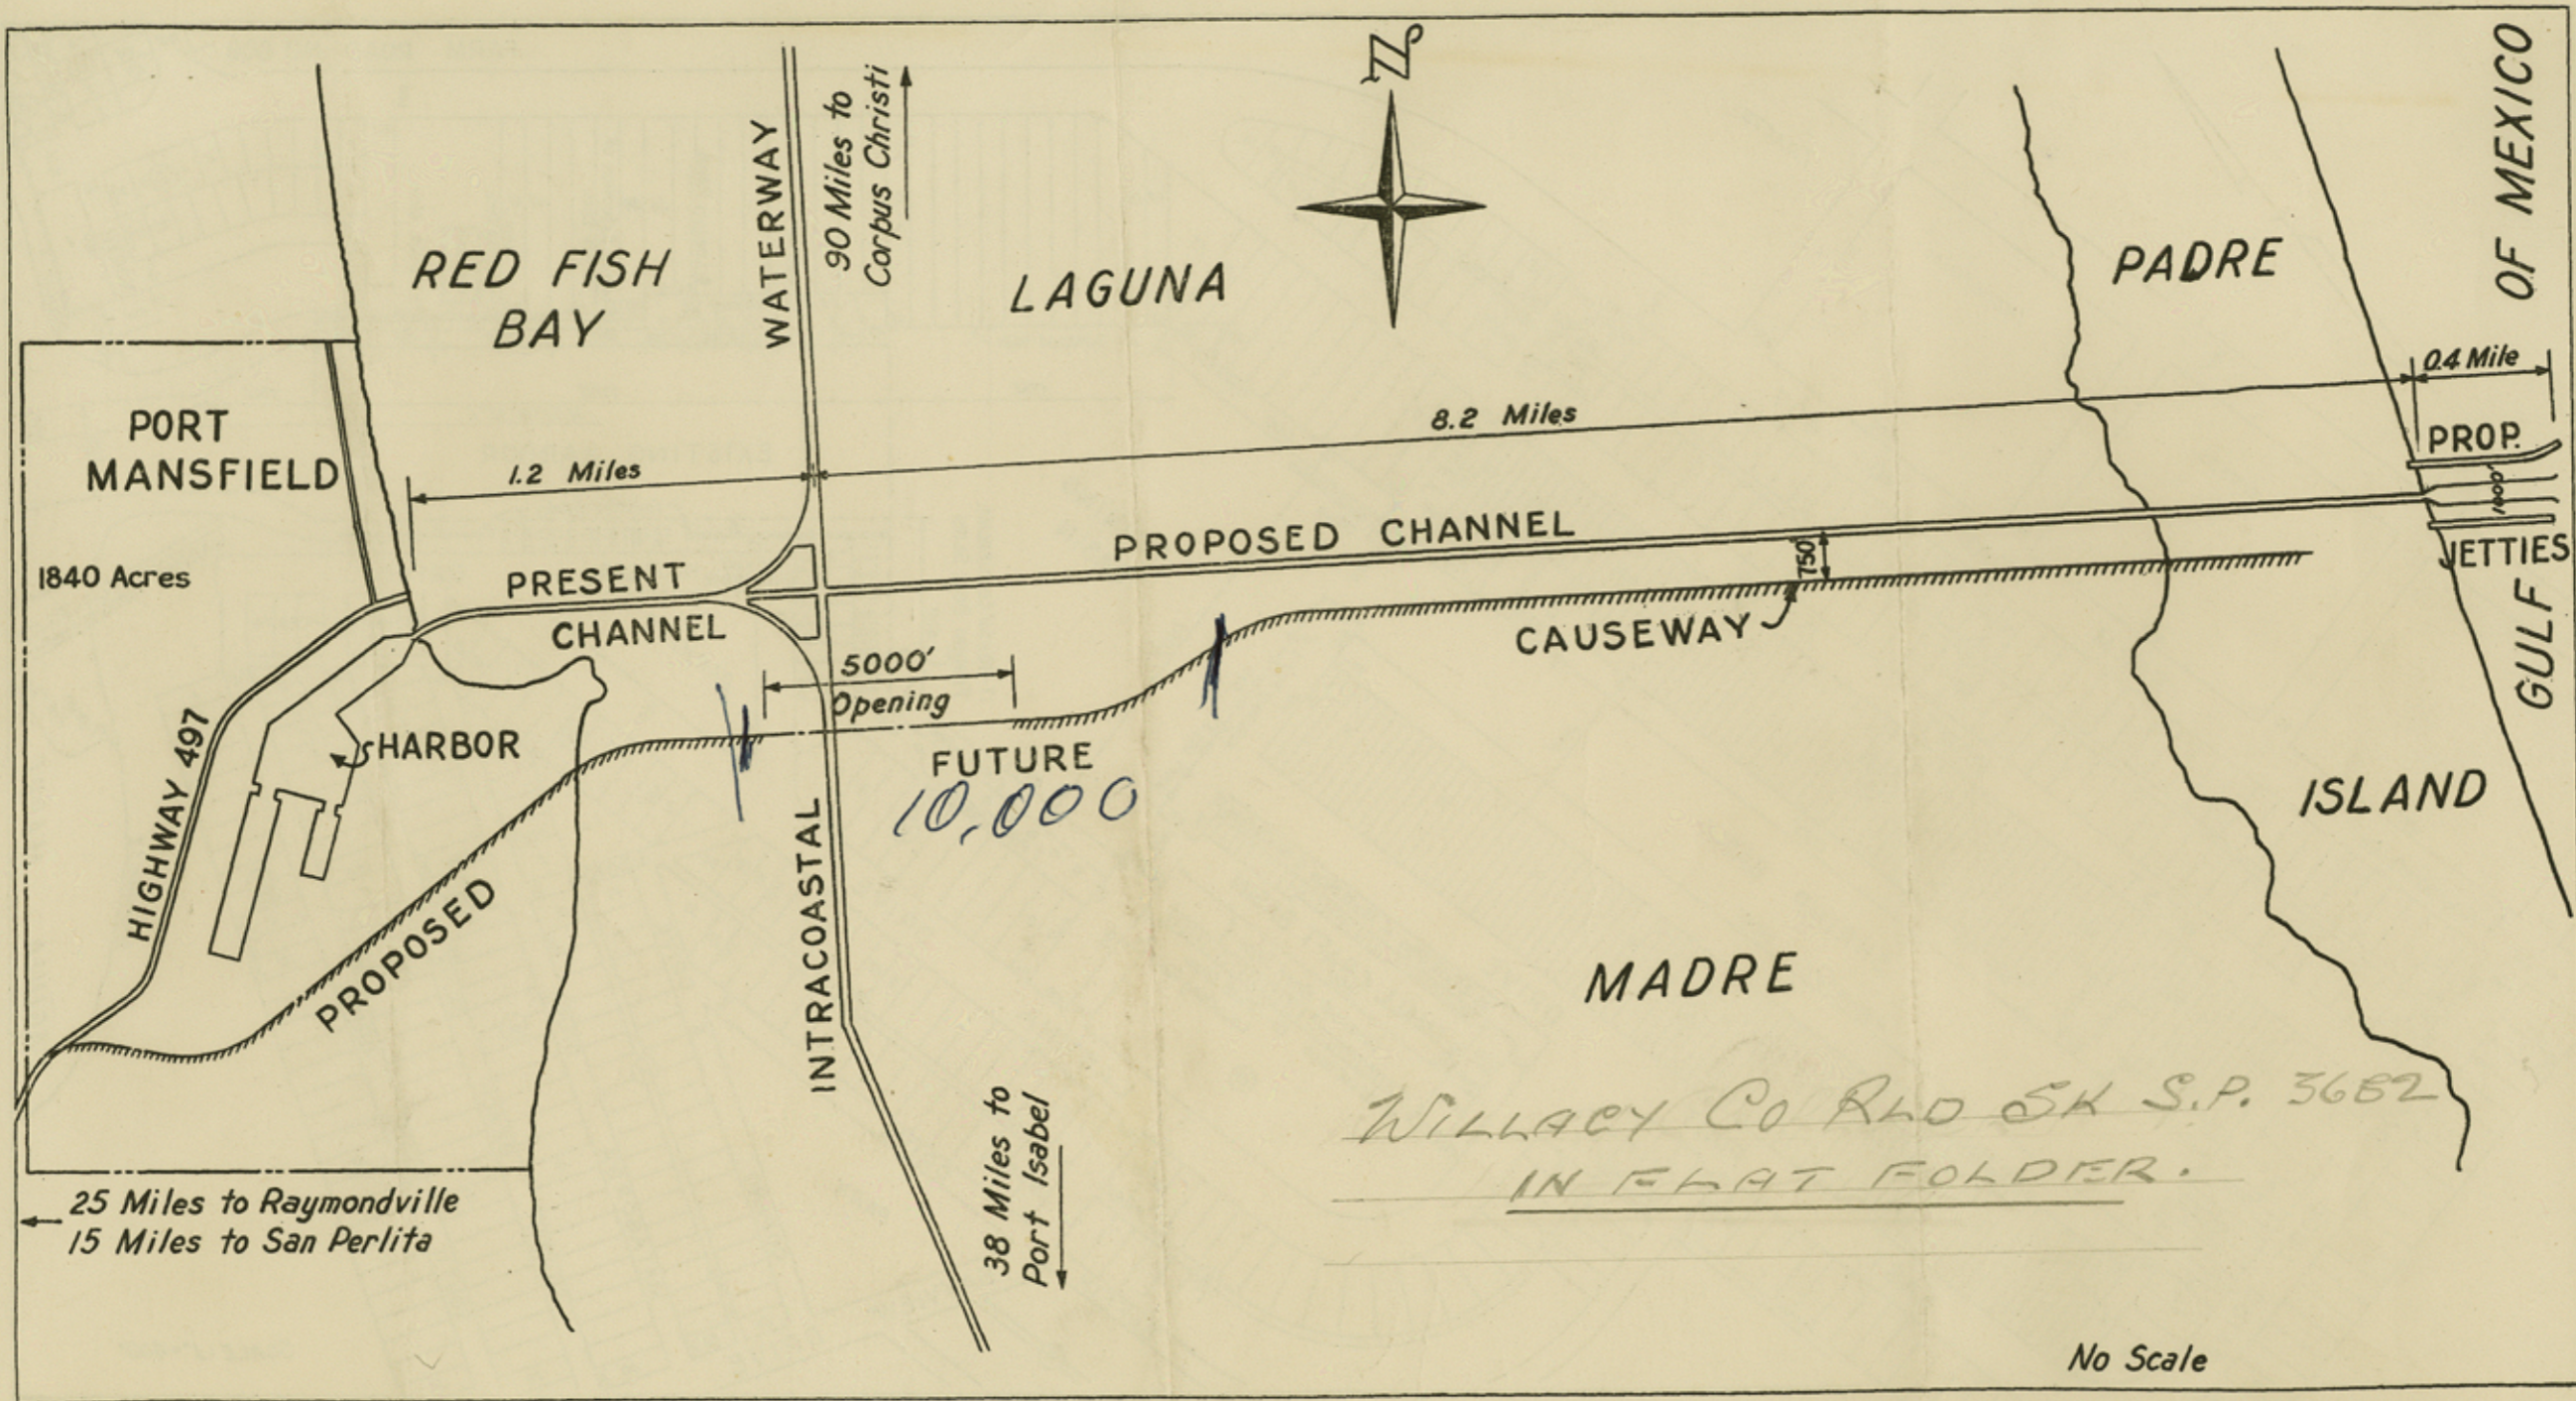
DETAIL OF HARBOR ENLARGEMENT AND IMPROVEMENTS PLAN
